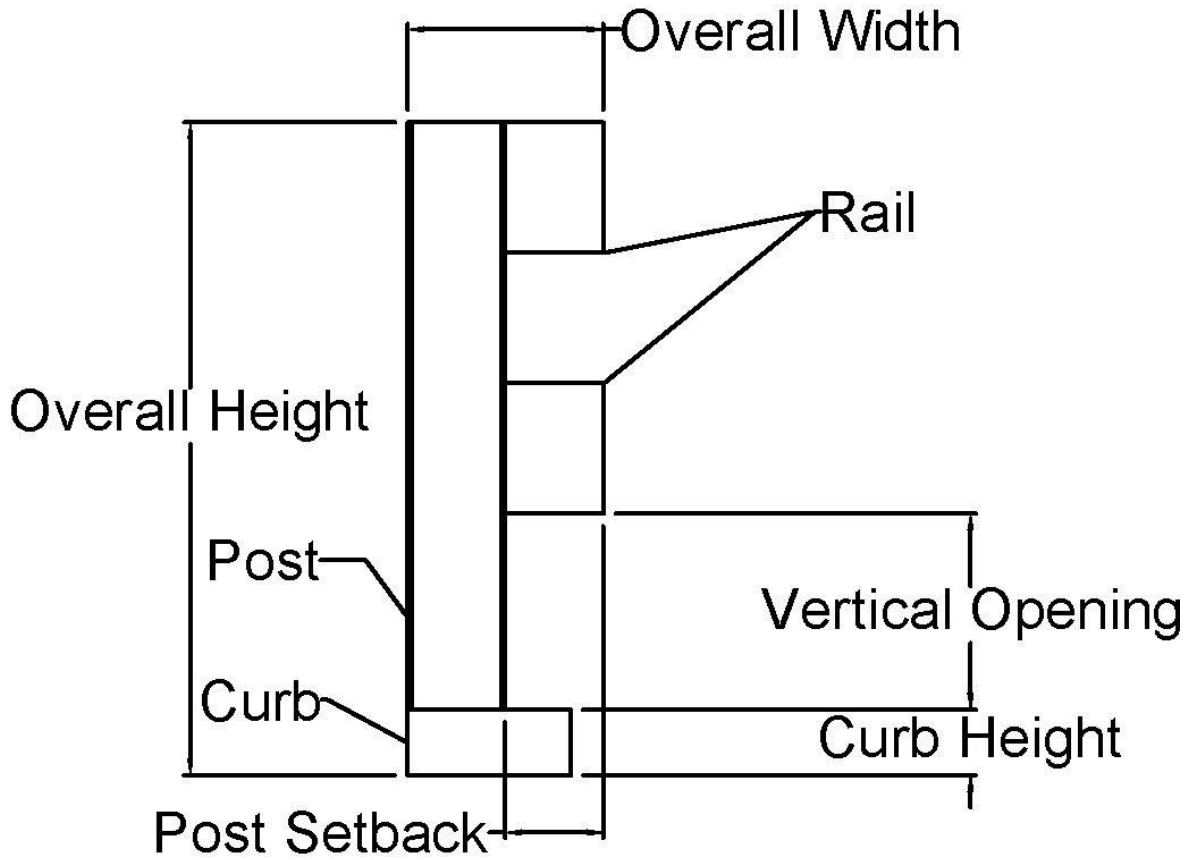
Steel Bridge Rail General Dimensions, Cross Section
